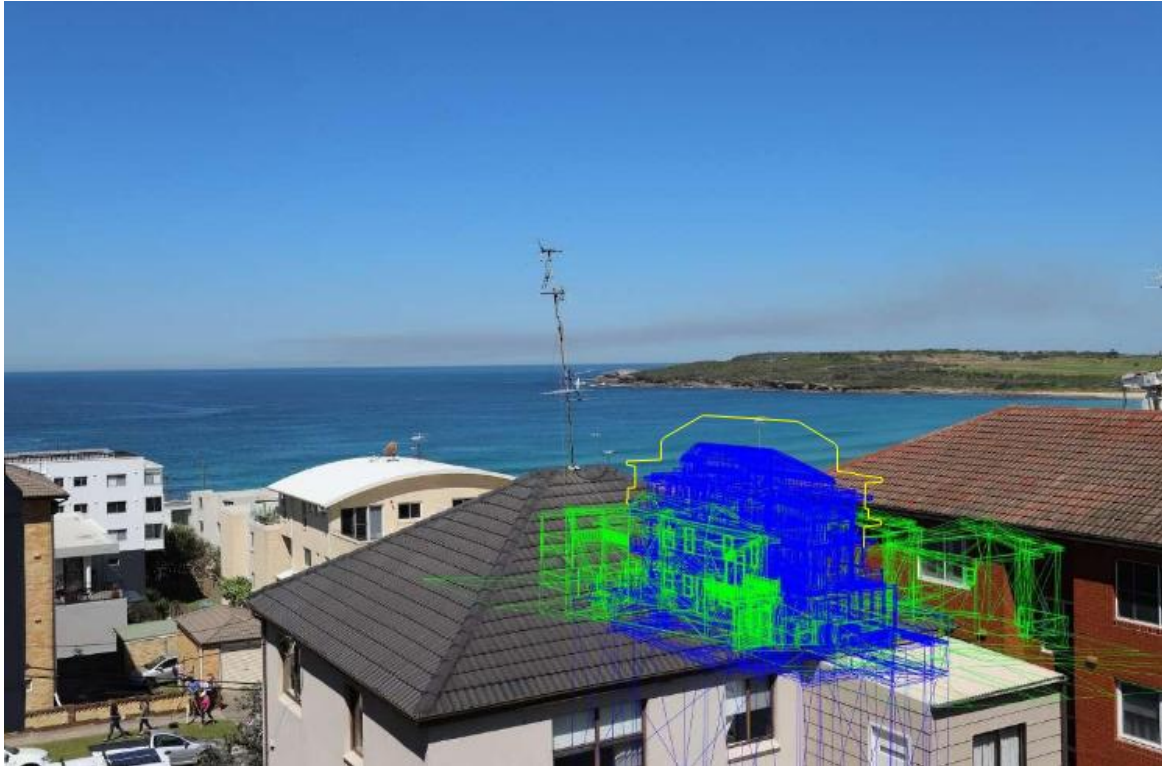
Unit 9 forward facing view from balcony attached to lounge room.
